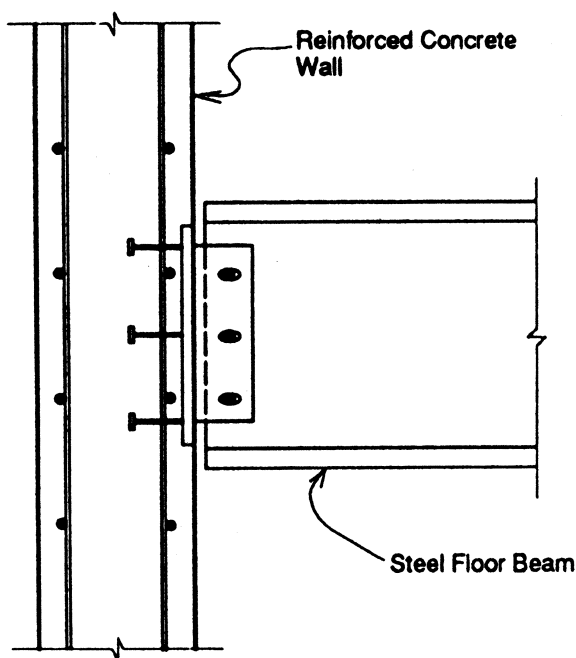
Steel beam-to-RC wall gravity load shear connection.
